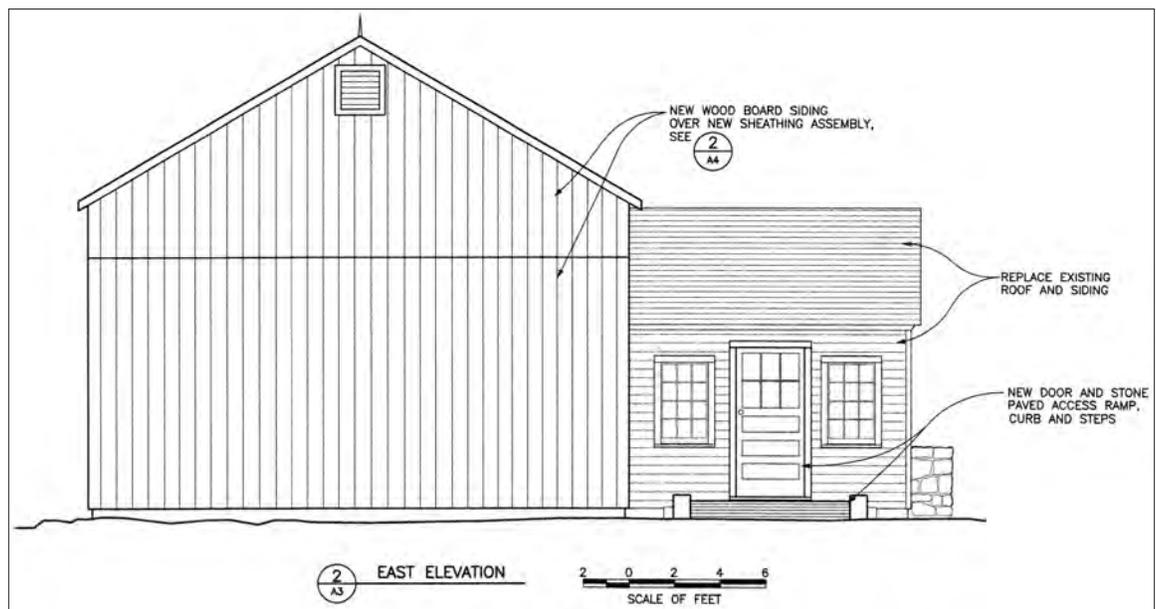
Rehabilitated Burlingham Barn east elevation. The right side of the elevation shows the entry to the accessible restrooms in the annex. View looking west, 2002 (NPS).
